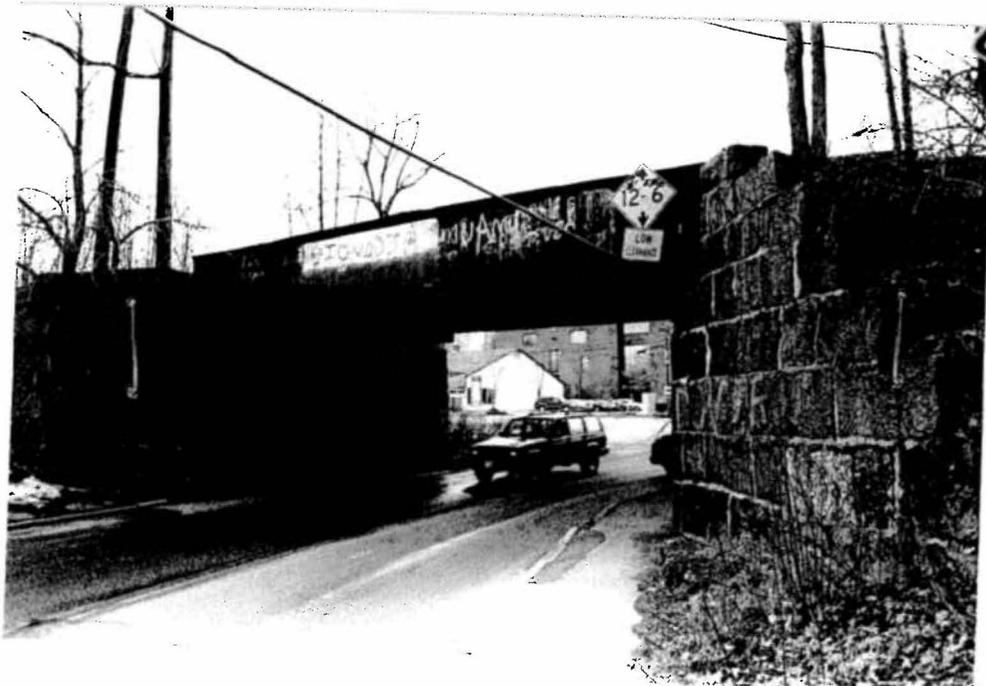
description: Thru Plate Girder Bridge over Bartlett Street, Portsmouth (56.19)
